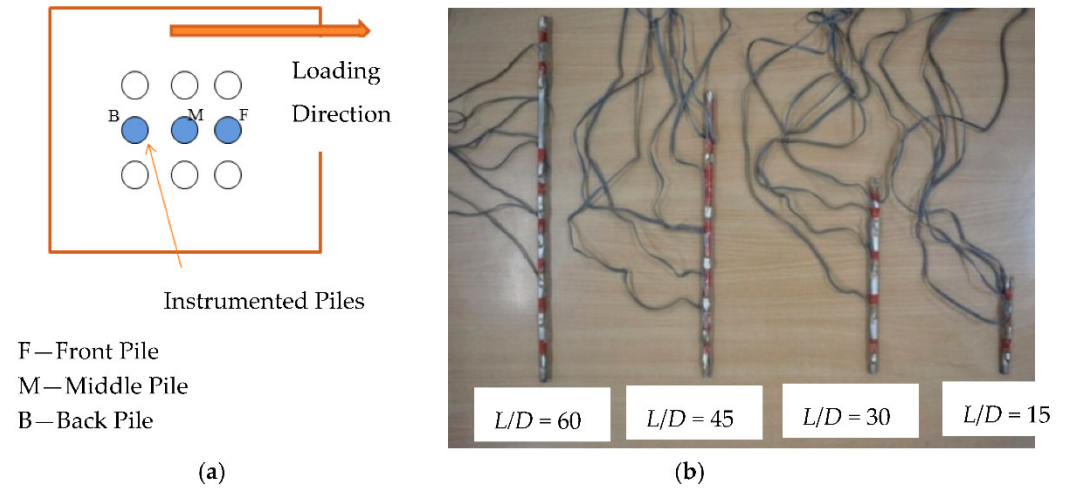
Instrumentation details: (a) details of the instrumented pile foundations, and (b) model piles with the strain gauges.
